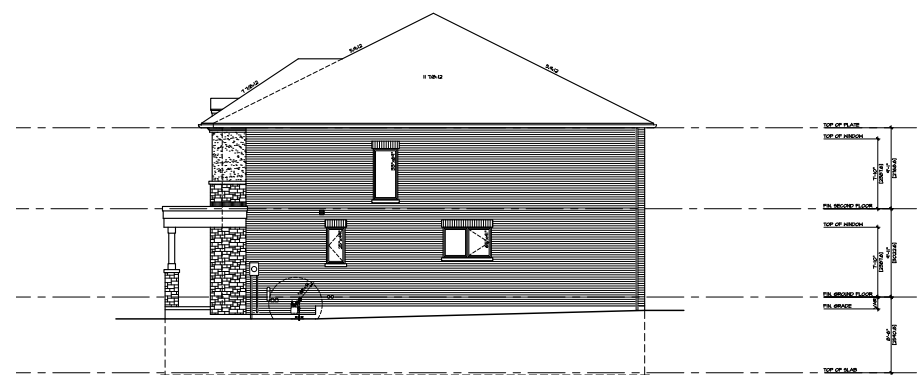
Front-Loaded Townhouse Right-Side Elevation
